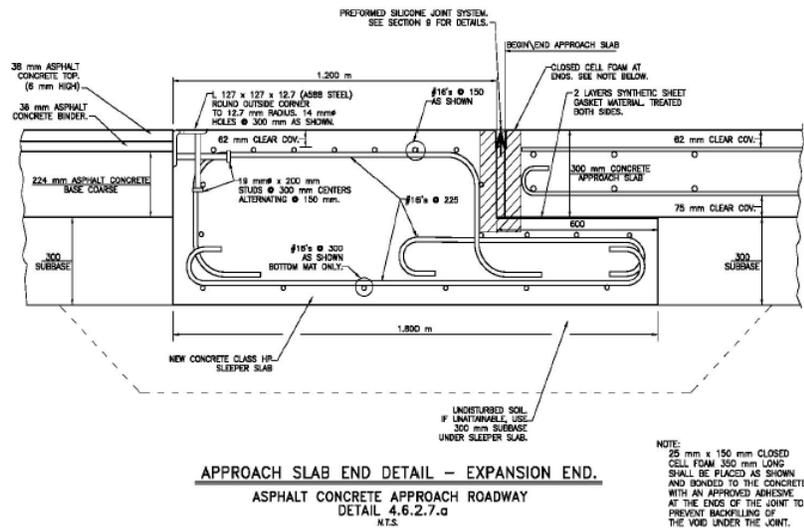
Sleeper slab with asphalt pavement approach. (New York DOT)
